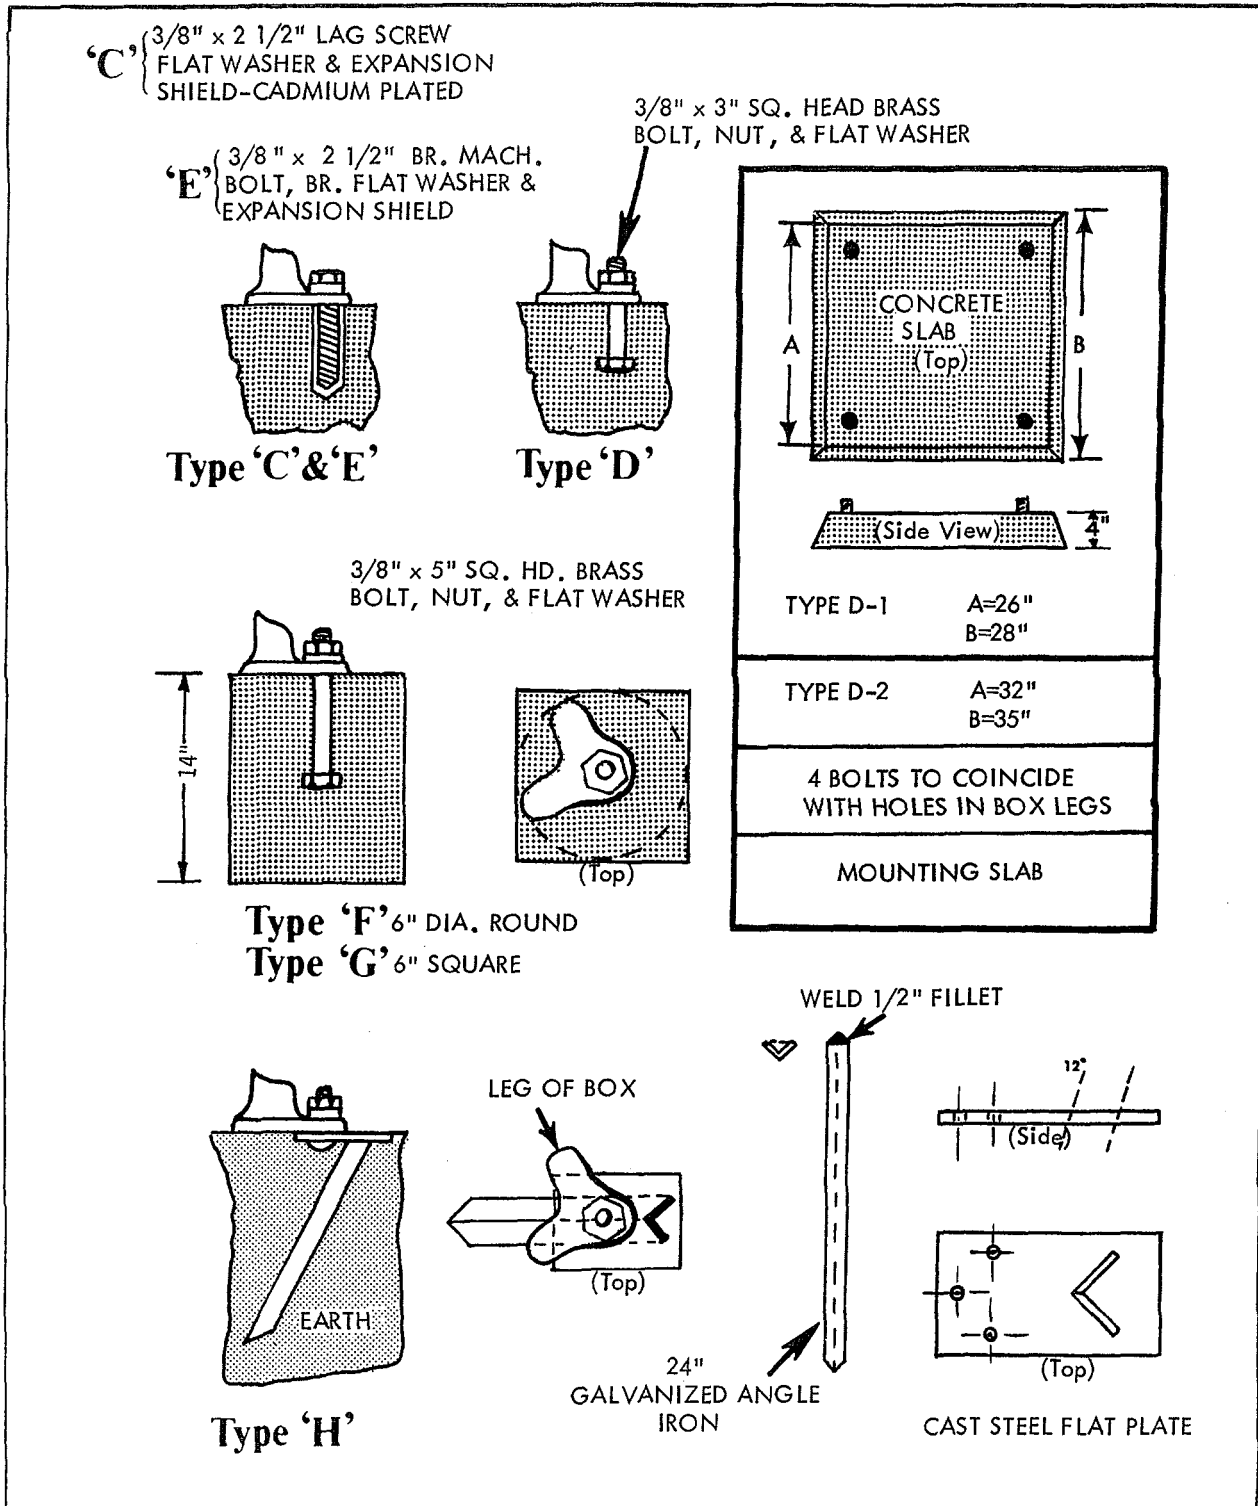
Measurement Details - Collection Box Anchoring Devices
